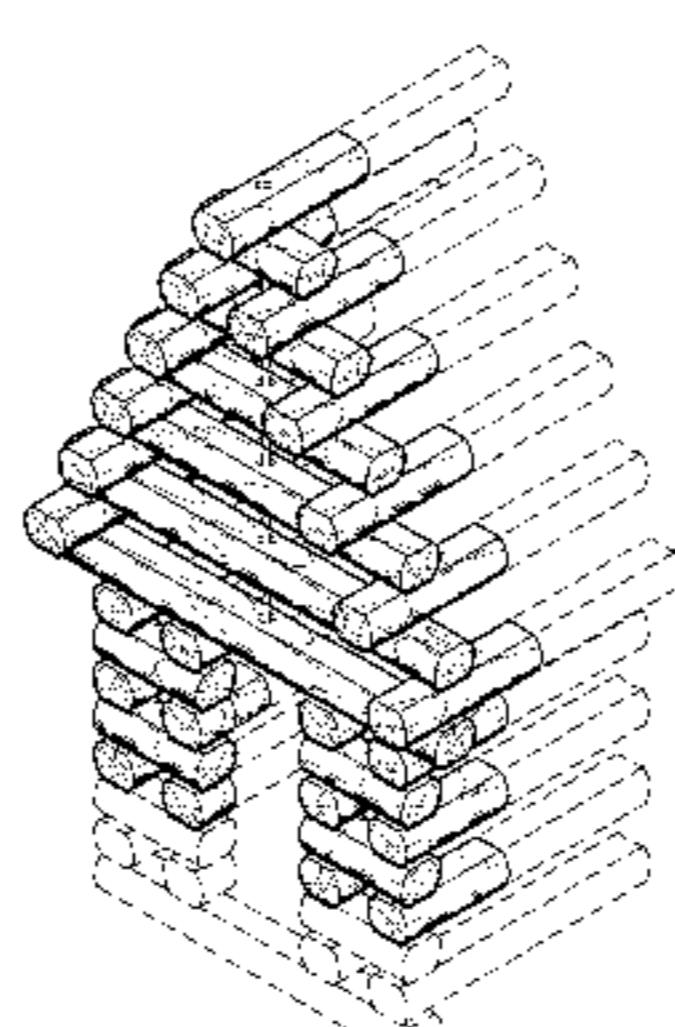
is a bottom view of said second embodiment of a partial gable end roof and wall structure with holes at points of connection and the continuation of roof and wall members being shown in broken lines as part of the typical environment of use;
